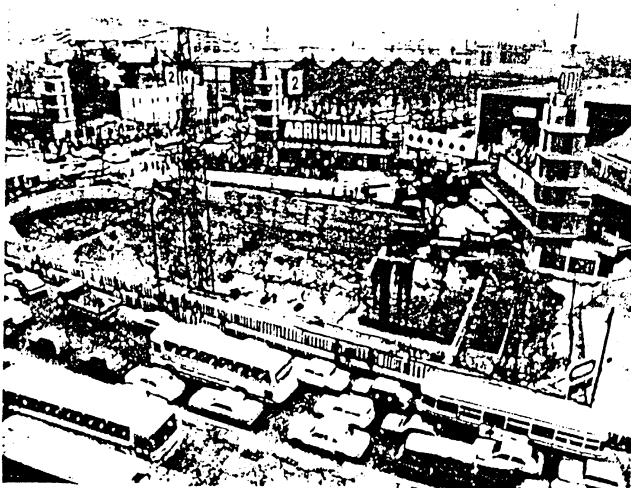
Excavation for the underground car park, Boulevard Victor, Paris, 1978. (Medio et al, 1983)
